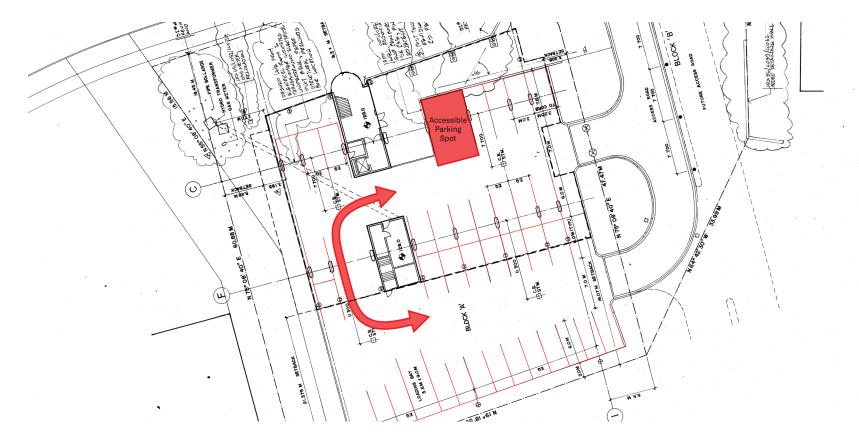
Original site plan showing 39 parking spaces, a circular transportation loop, and relocated accessible parking space
